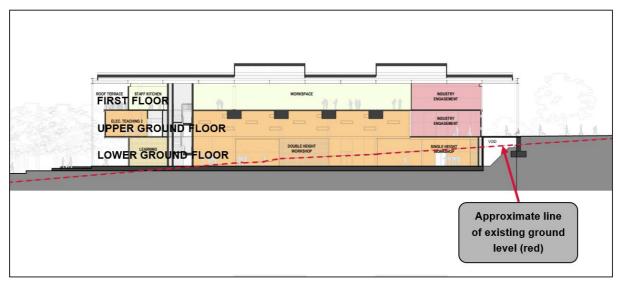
| Proposed IATC Building east-west section (Source: Applicant's RtS)
